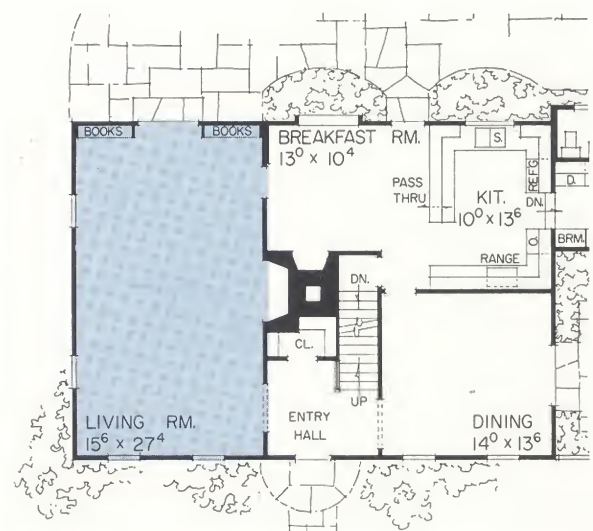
Closed-plan living room. (Home Planners, Inc.)
